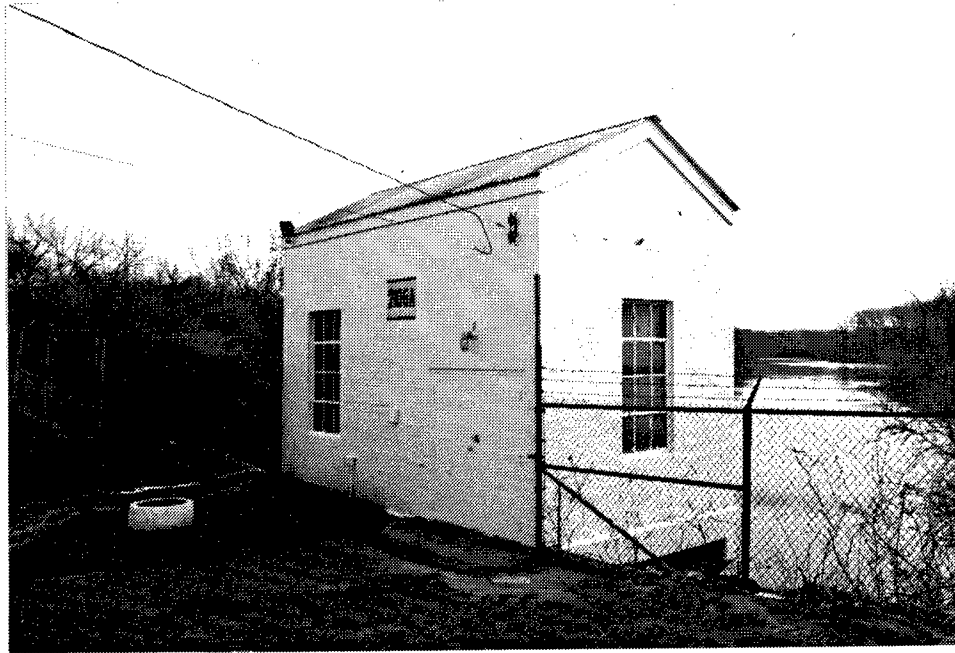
Building 2106A: Pump Station with low lift where the Plant's water is pumped from the river.
